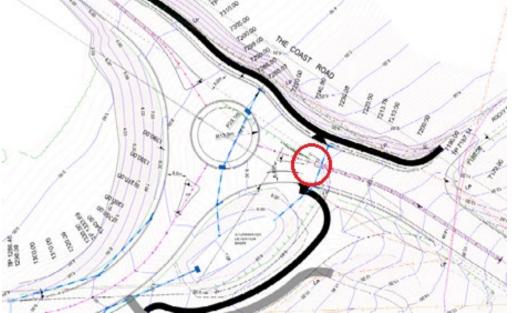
Engineering Drawing of Skennars Head Road Roundabout
